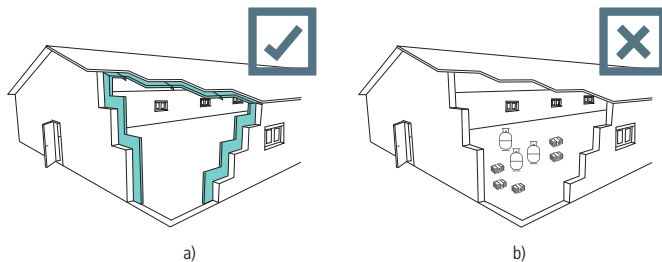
Typical poultry farm with (left) the ceiling and walls well insulated with polyurethane sandwich boards or polyurethane foam and (right) without any kind of insulation¹¹
